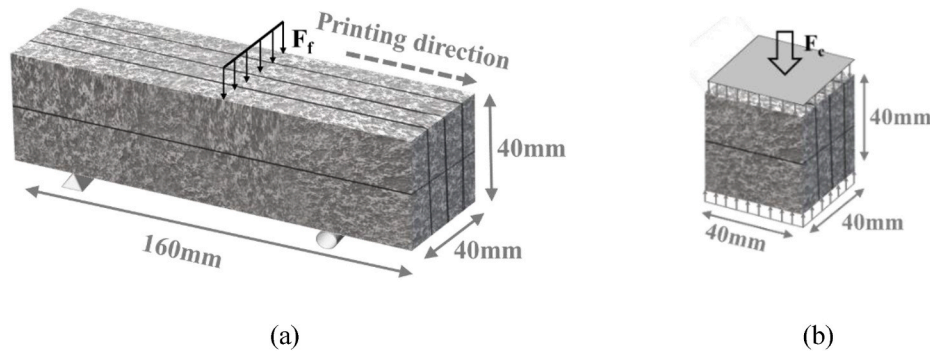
Loading of specimens: (a) flexural; (b) compressive test.
